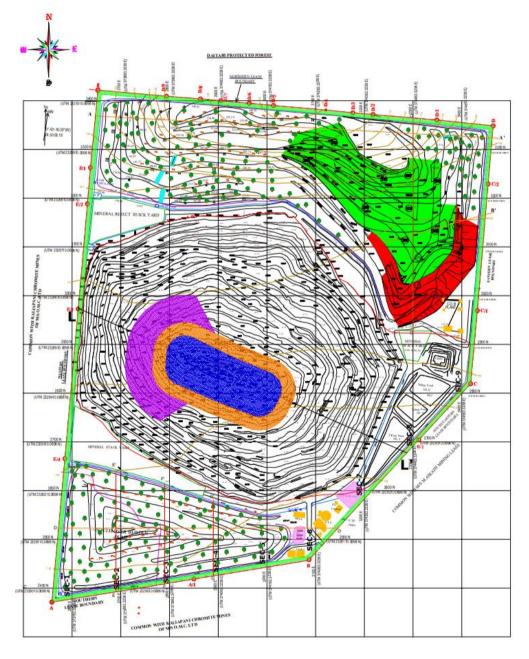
Plan of North and South Dumps of Ostapal Chromite Pit
